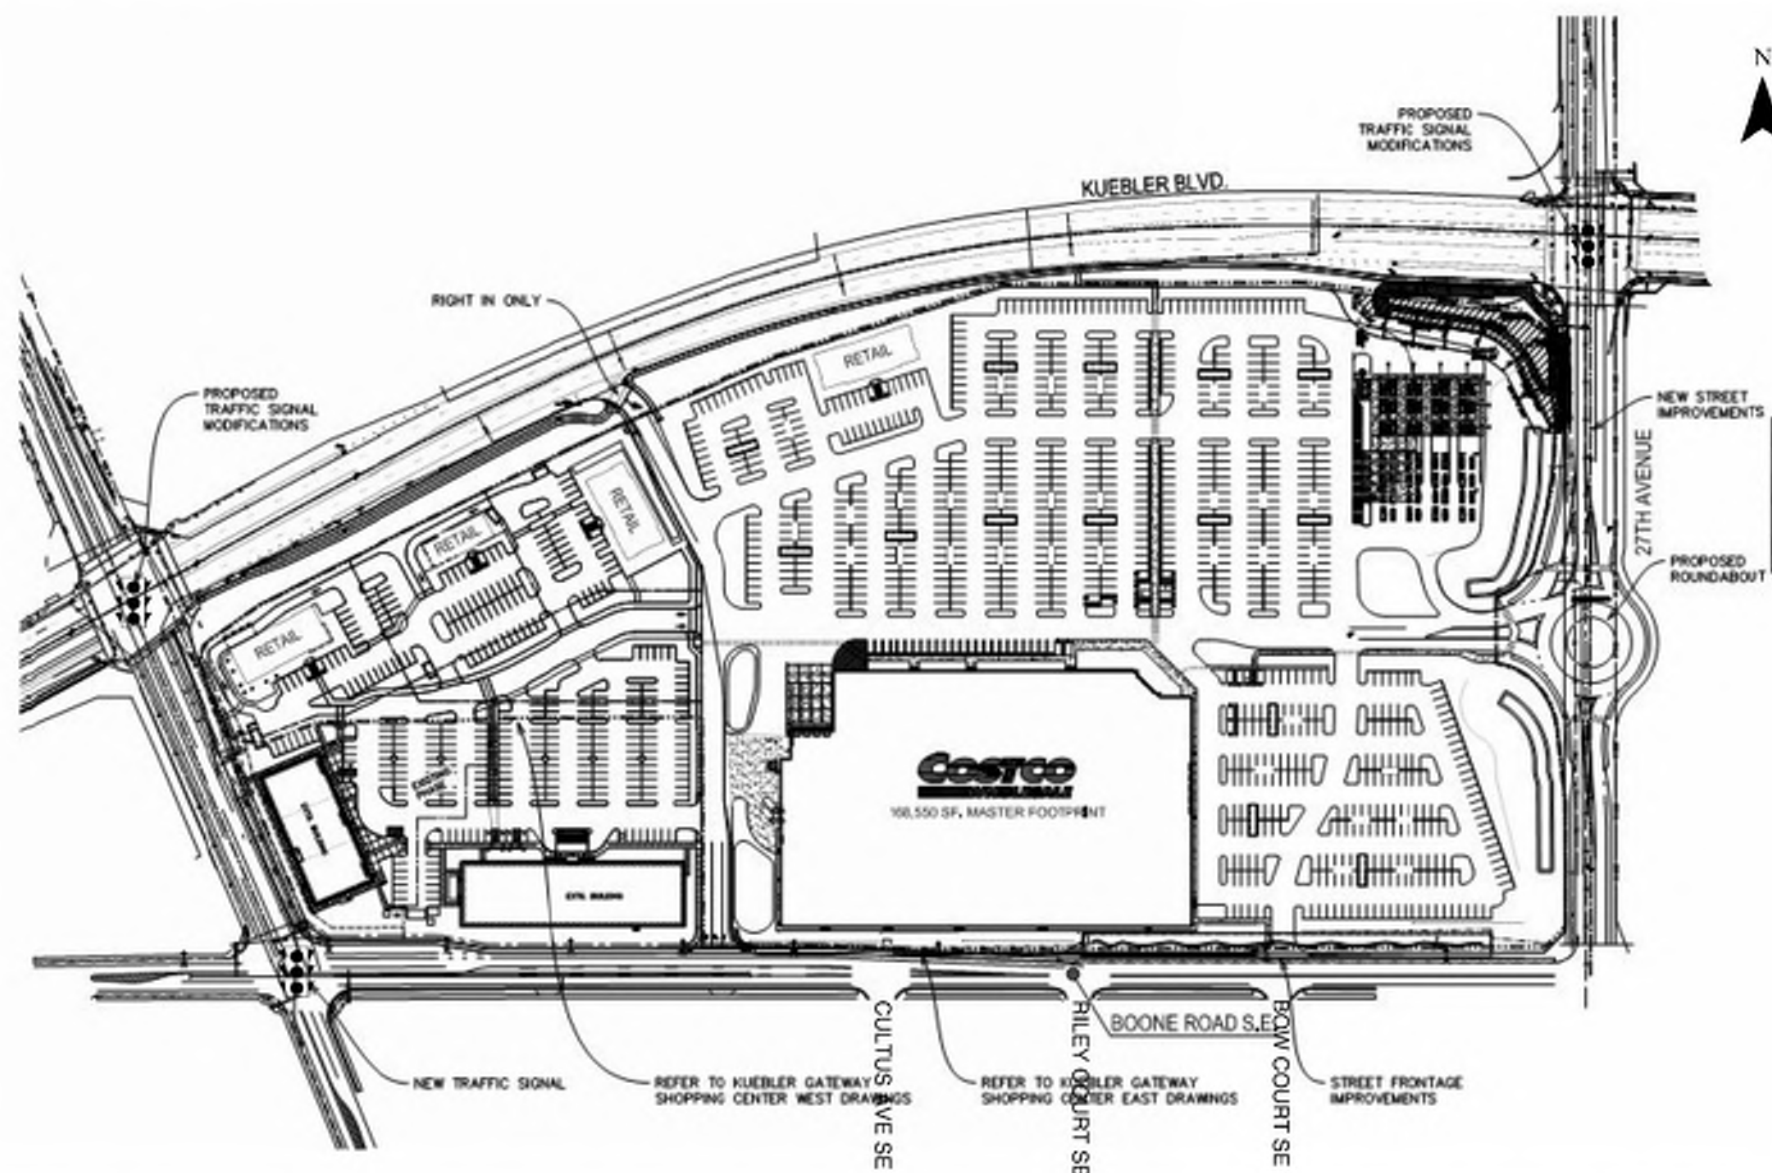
illustrates the preliminary site plan for the proposed Kuebler Gateway Shopping Center. Access to the shopping center is proposed via the following locations:
